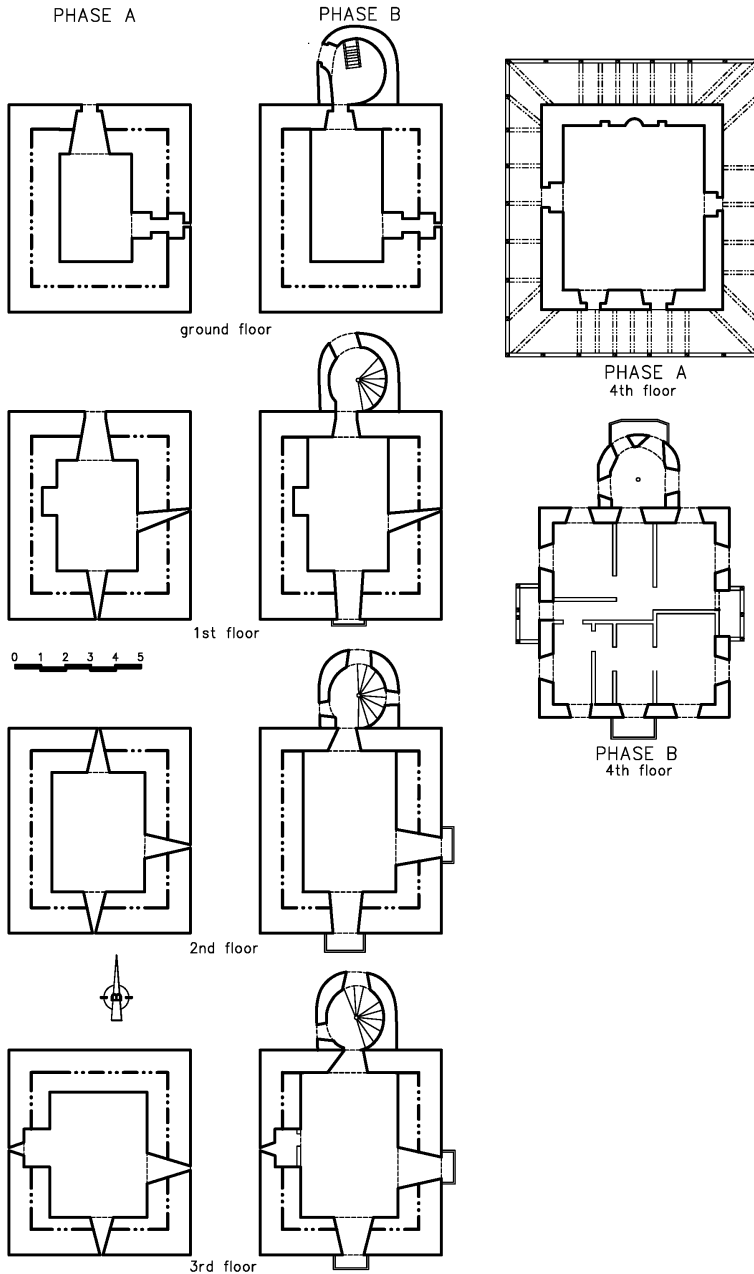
Plans of the ground floor, 1st floor, 2nd floor, 3rd floor and 4th floor of the initial (Phase A) and final (Phase B) of the Tower of Kokoslis.
